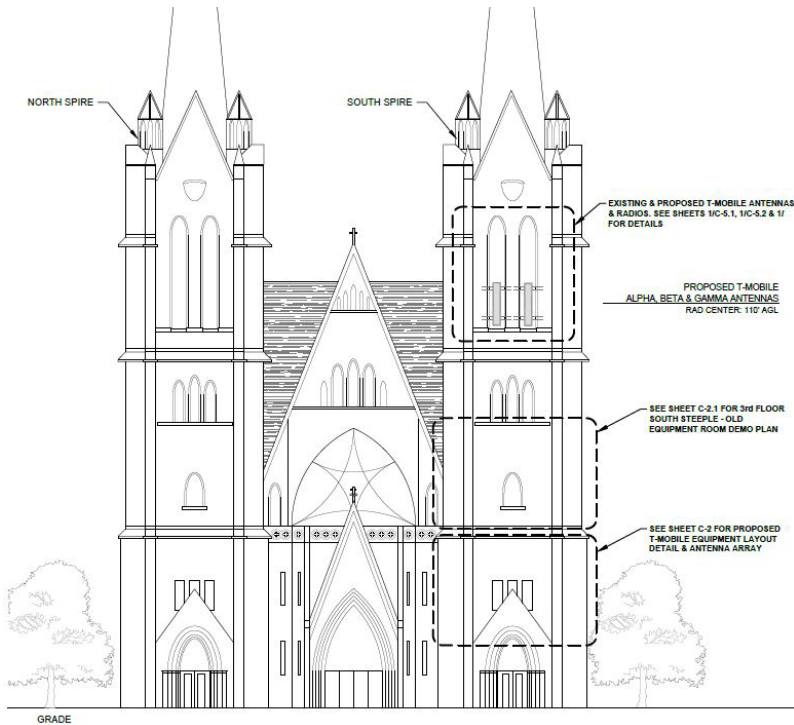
, by Applicant: West elevation depicting locations of antennas and interior equipment, C-5
